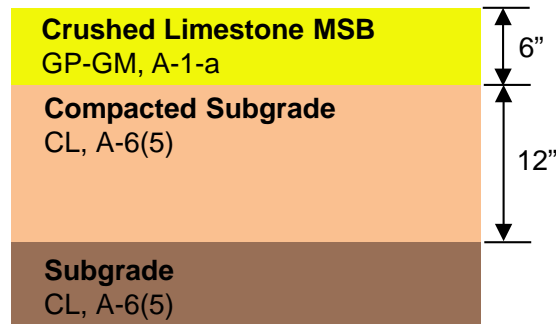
Pavement foundation profile on 8th St. North and South test sections
